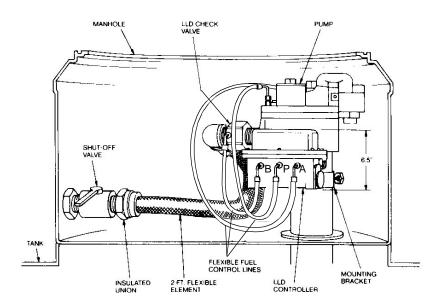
Typical Red Jacket VLLD Installation (side view, horizontal check valve mount)
